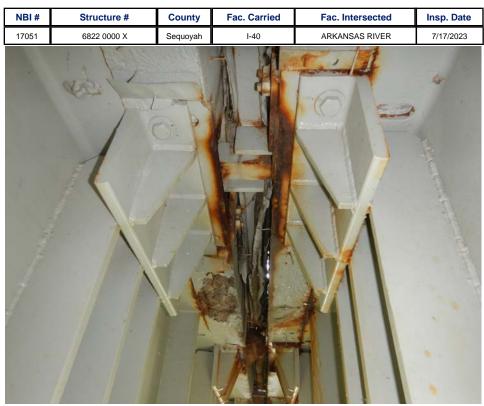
Looking south at the underside of the pier 10 modular joint at support box 3. Note: support beam is no longer attached to the transverse support beam and has slid east.
